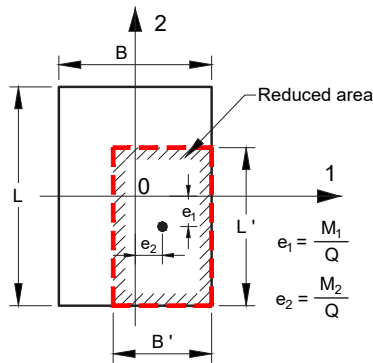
Effective cross-sectional area of a rectangular foundation
